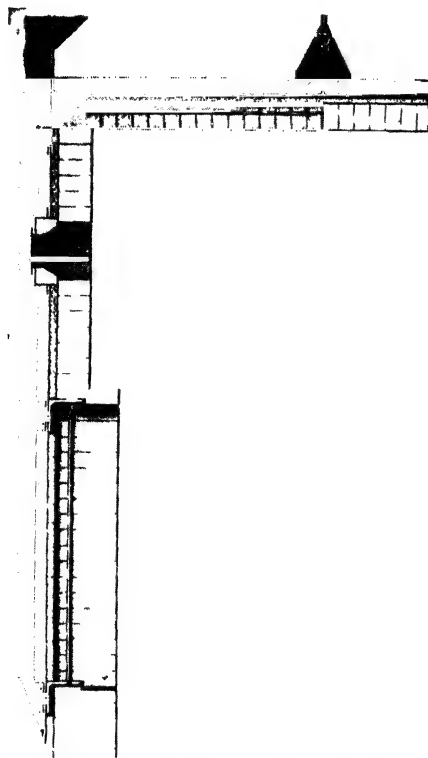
Lightweight suspended wall and roof construction. (Courtesy of The Lummus Company.)
